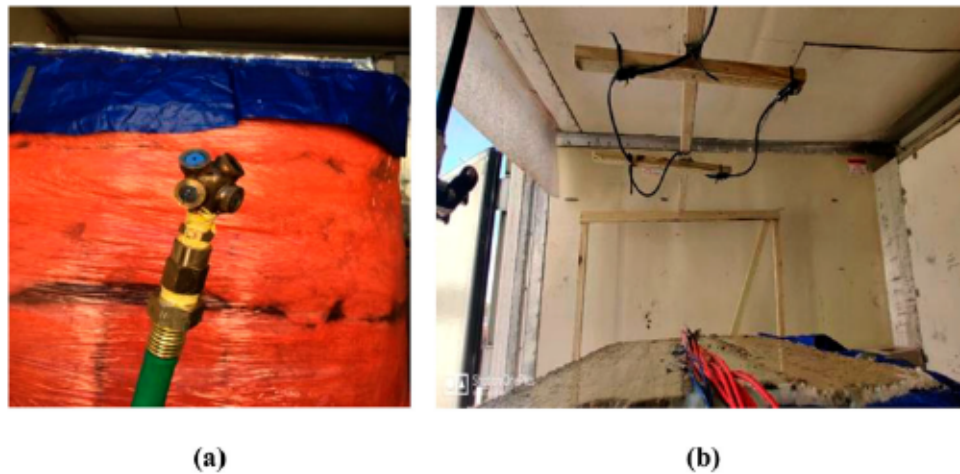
(a): Insulated and wrapped pavement column with original misting nozzle head (b): Modified misting system.
